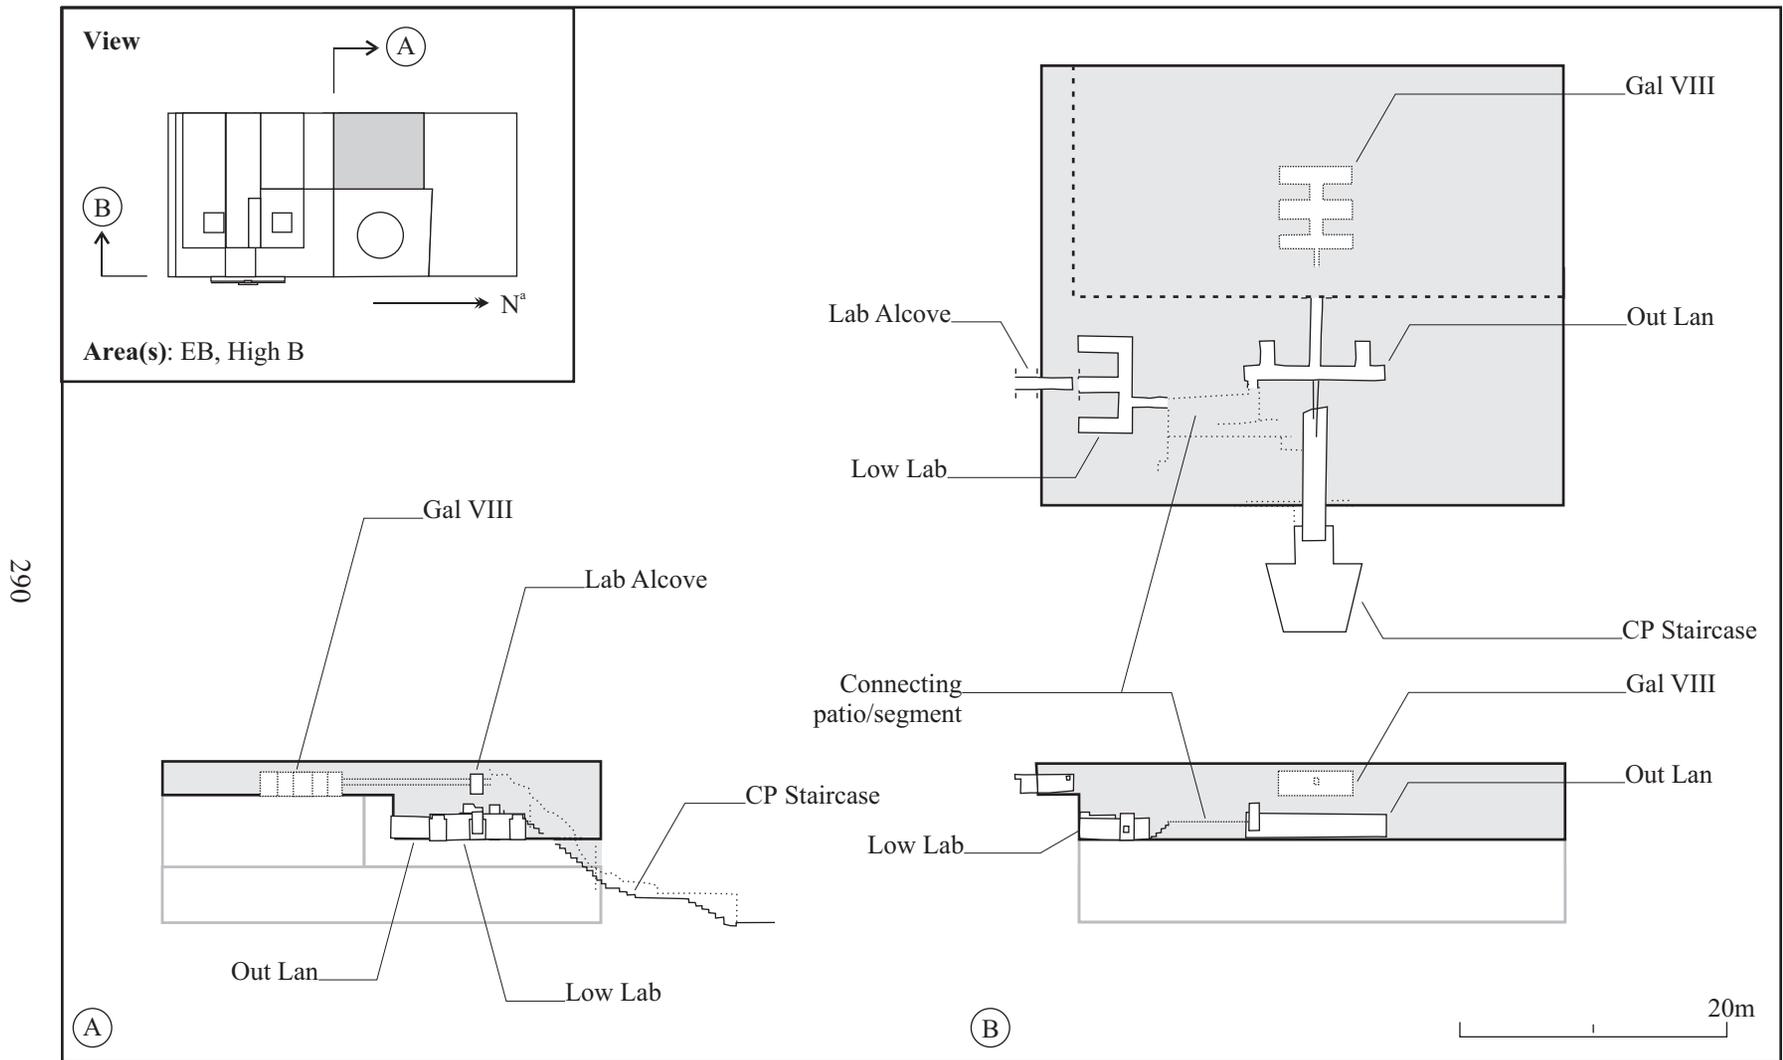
Building B Construction Phase 3: EB-High B Phase. CP Staircase not shown in view (B).
